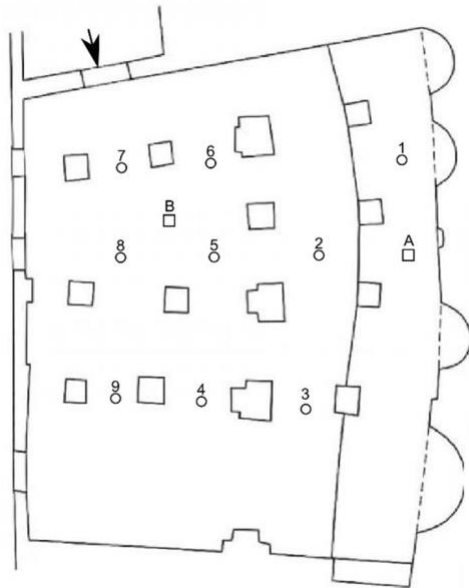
Plan of the church with location of source (A,B) and receiver (1-9) positions
